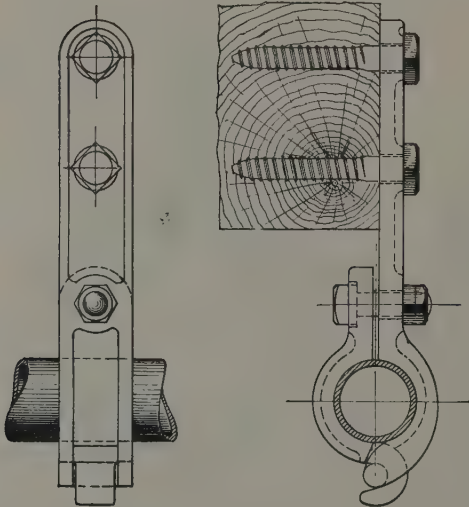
Acme Pipe Clamp for Side of Longitudinal Sill. Western Railway Equipment Company.
